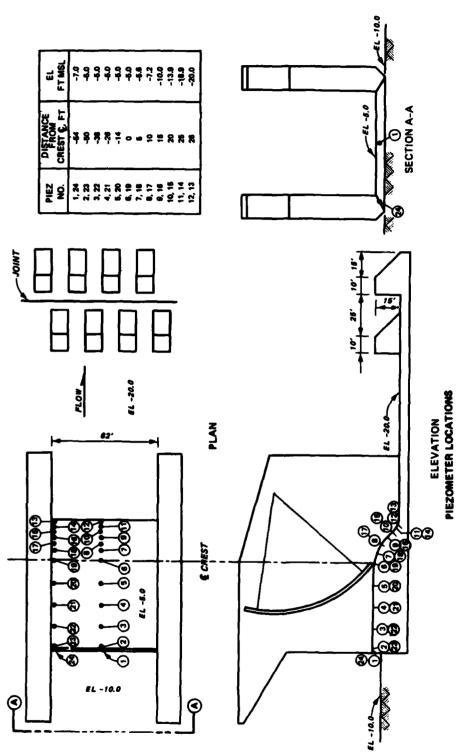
Piezometer locations and elevations for one gate bay, spillway crest
